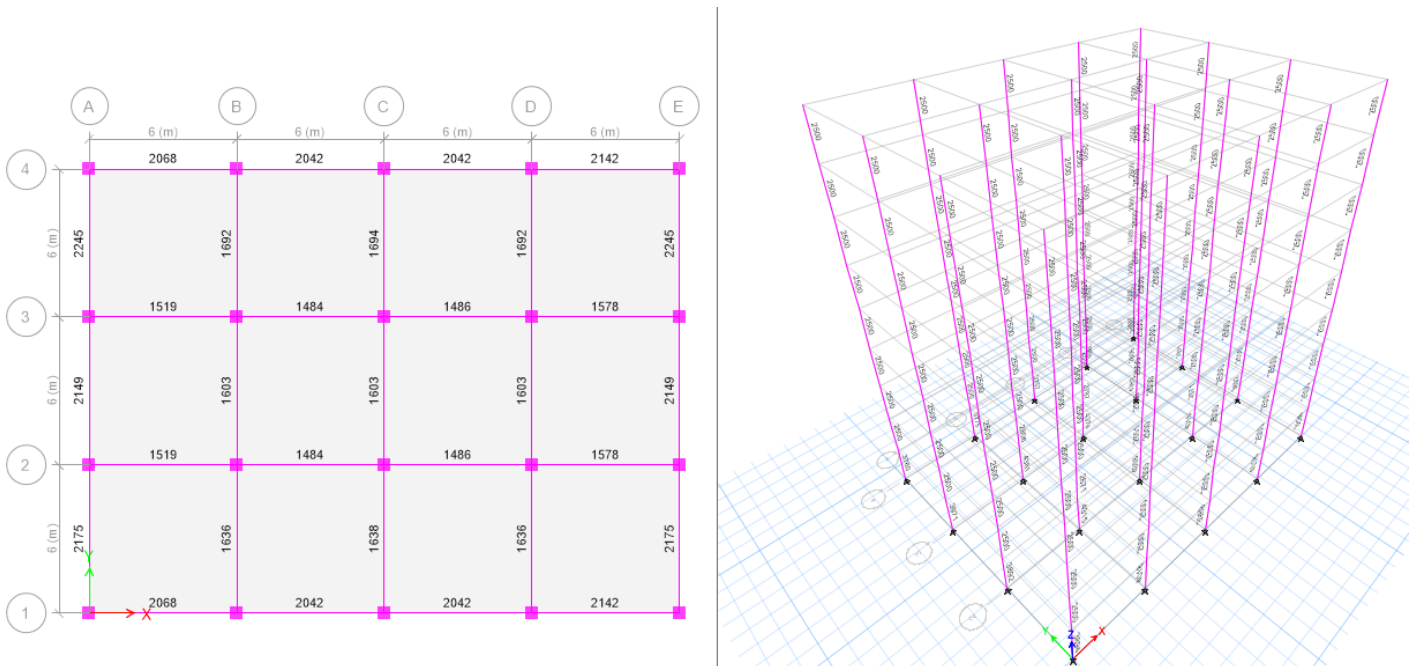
Output Design of the 9-Story Structural Building Showing the Required Reinforcement Area (mm).
